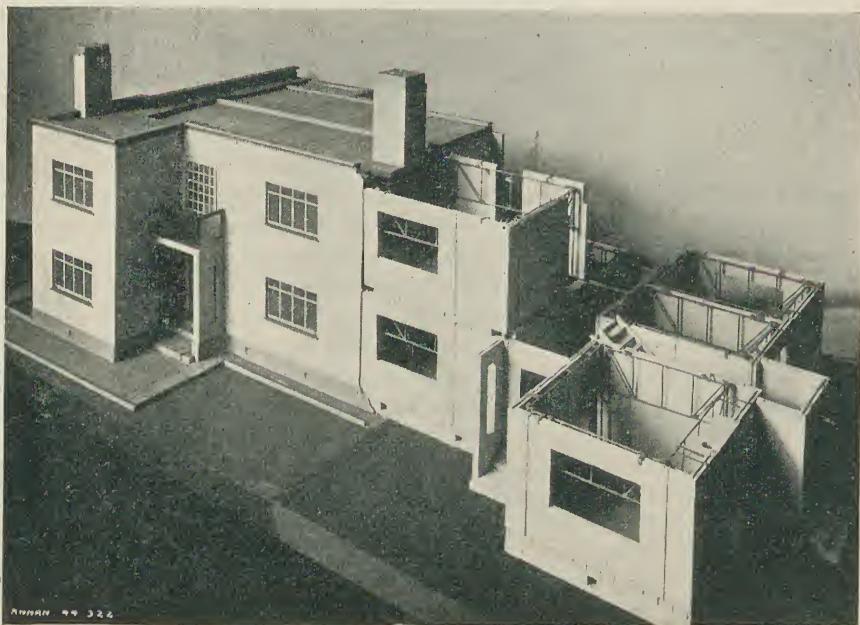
MODEL OF PRECAST CONCRETE HOUSES BUILT WITH LARGE SLABS.
